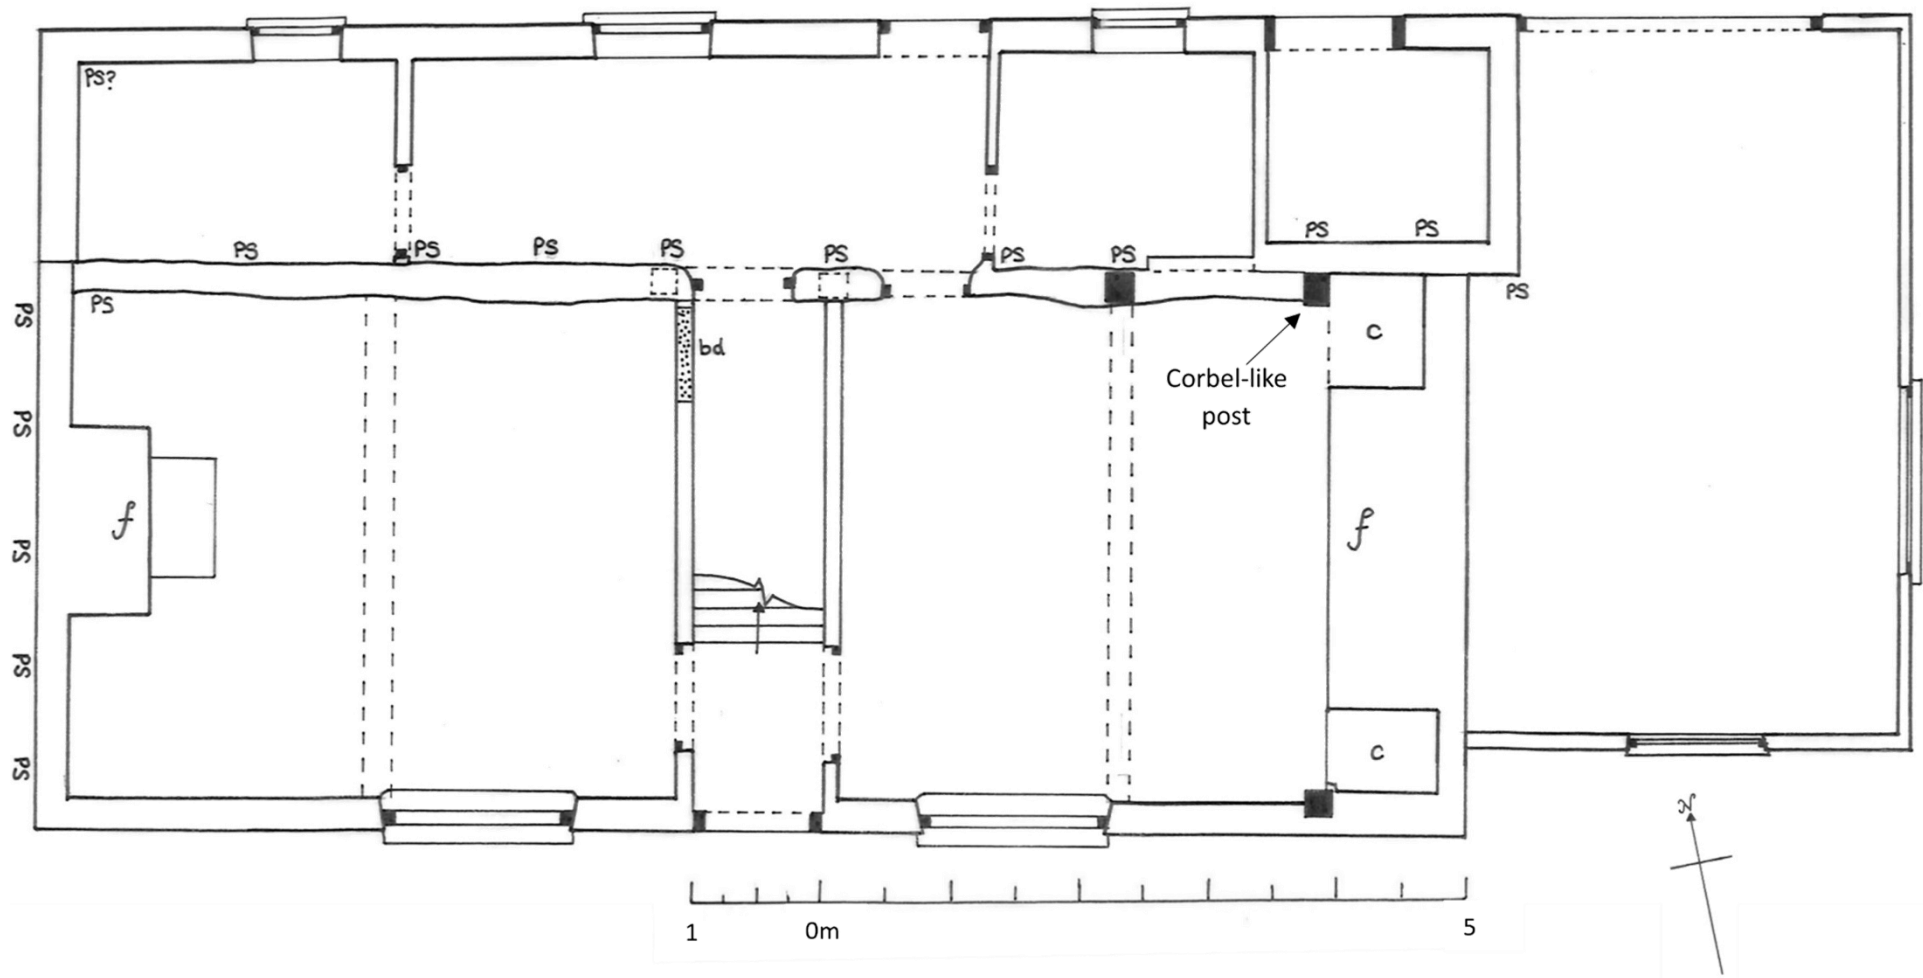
Ground floor plan showing location of padstones (marked 'PS')
